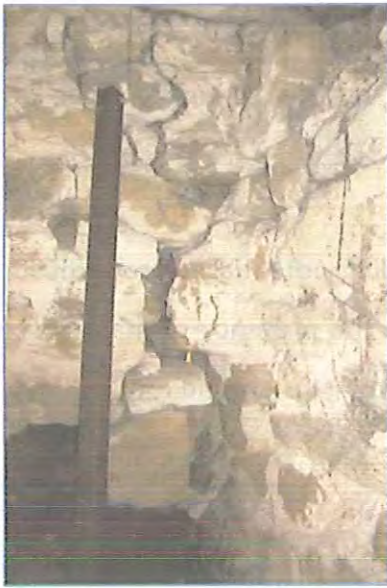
Large crack in internal wall separating unit d from e.
